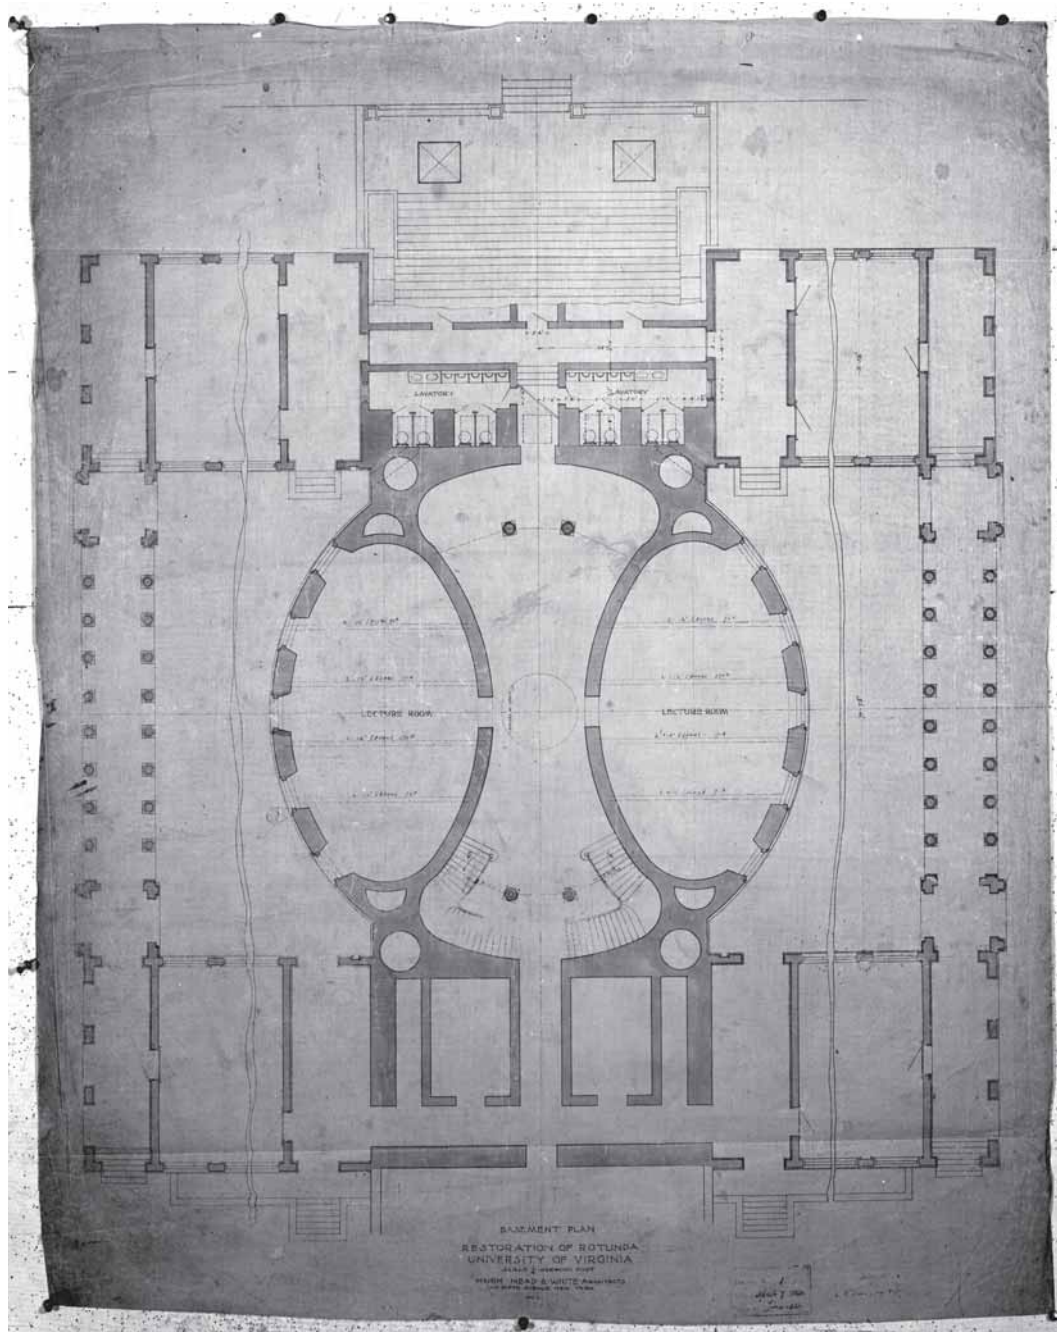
McKim Mead & White ground floor plan for the Rotunda. [Special Collections, UVA]
